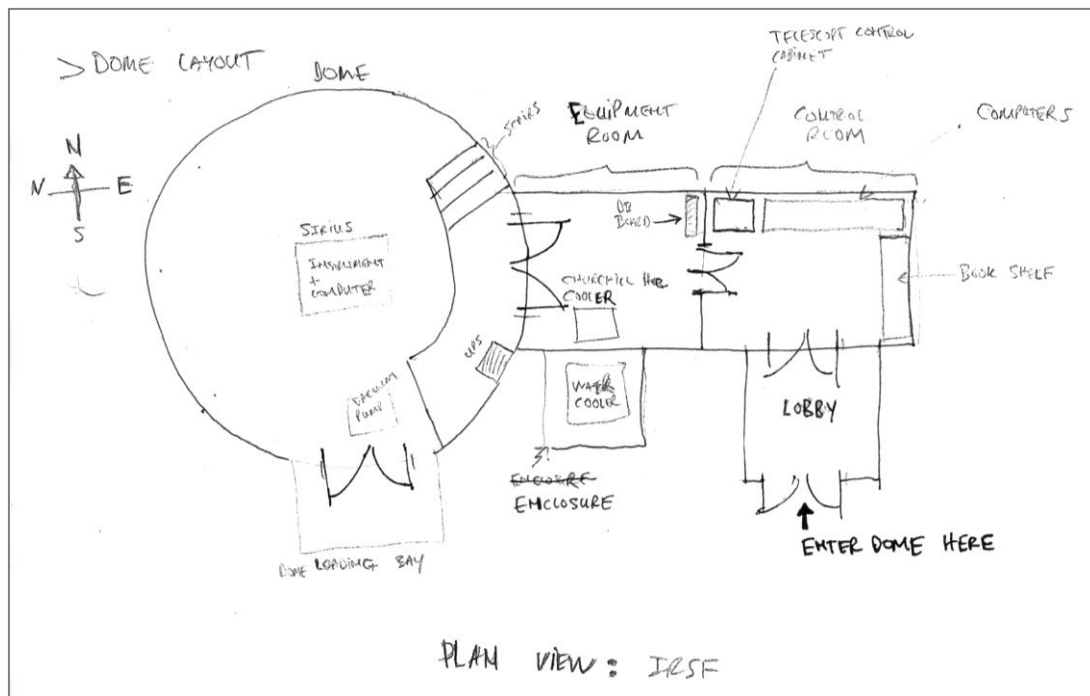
THE FLOOR PLAN SHOWS THE LAYOUT OF THE DOME, THE ARROW INDICATES THE FRONT DOOR
